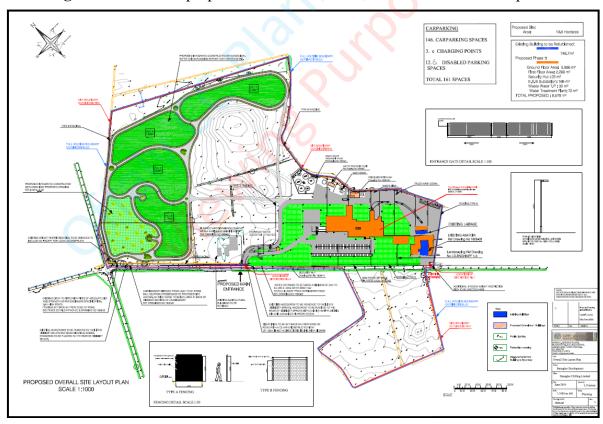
Proposed overall site layout plan showing location of abattoir extension relative to integrated constructed wetlands
